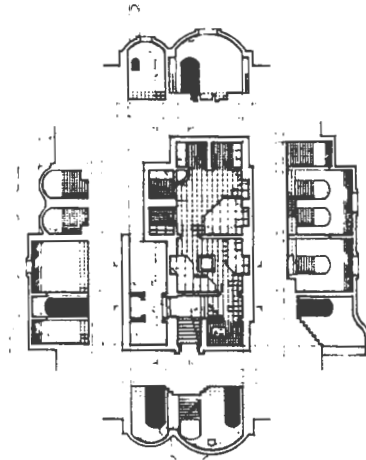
Village Bathhouse. Drawing technique adapted from local technique.
